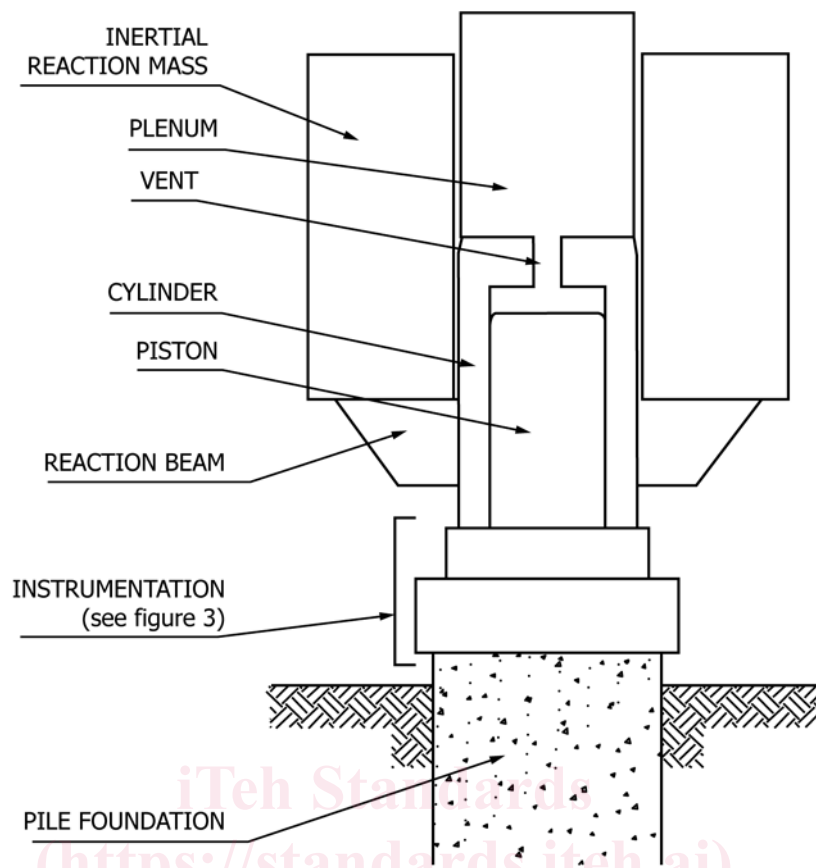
Schematic of a Combustion Gas Pressure Test Apparatus
